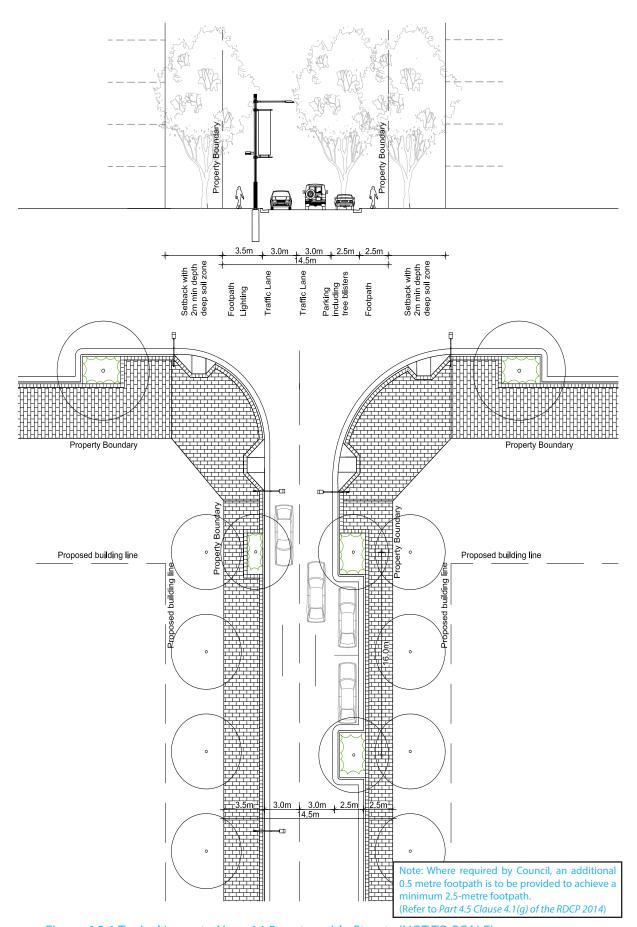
Typical Layout - New 14.5-metre wide Streets (NOT TO SCALE)
